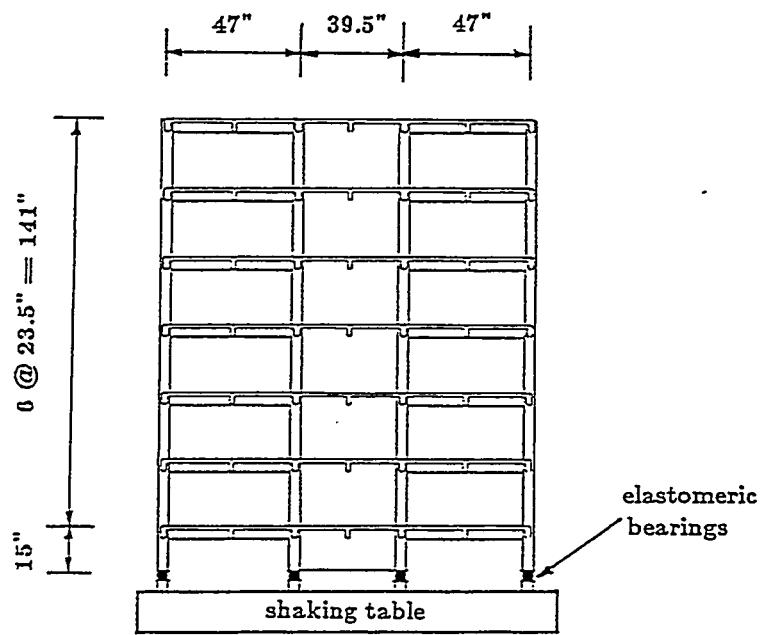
1/5-Scale Reinforced Concrete Test Structure
